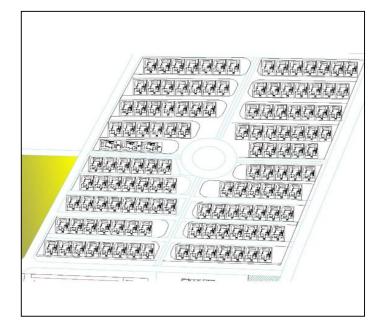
LAYOUT PLAN of BUNGALOW(HIG)
